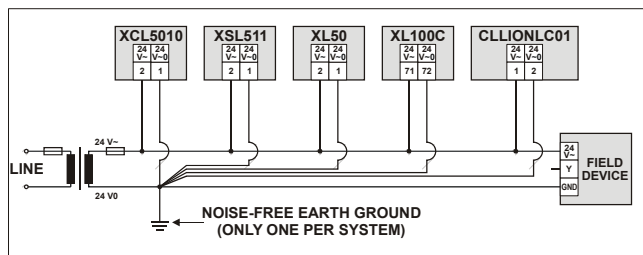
Connecting and earth grounding mixed controllers (single transformer)
